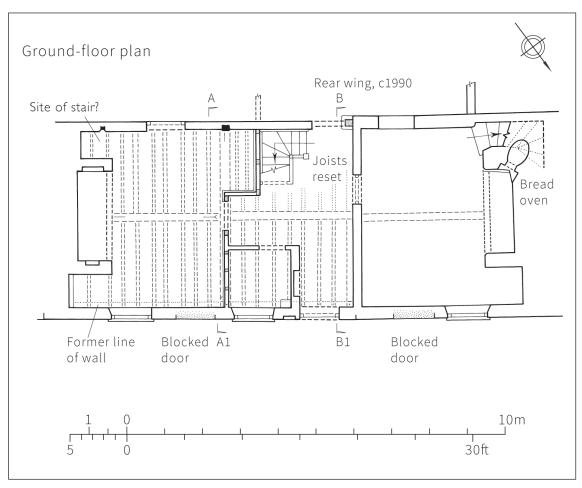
2 Waterside, ground-floor plan (Drawing Allan Adams © Historic England).
